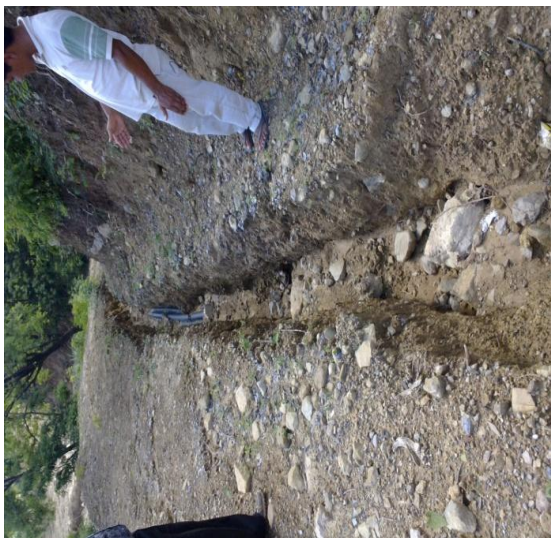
Erosion due to runoff water from hill/drain to be constructed.      Photo 6: Interaction with WUSC Chairperson/users
